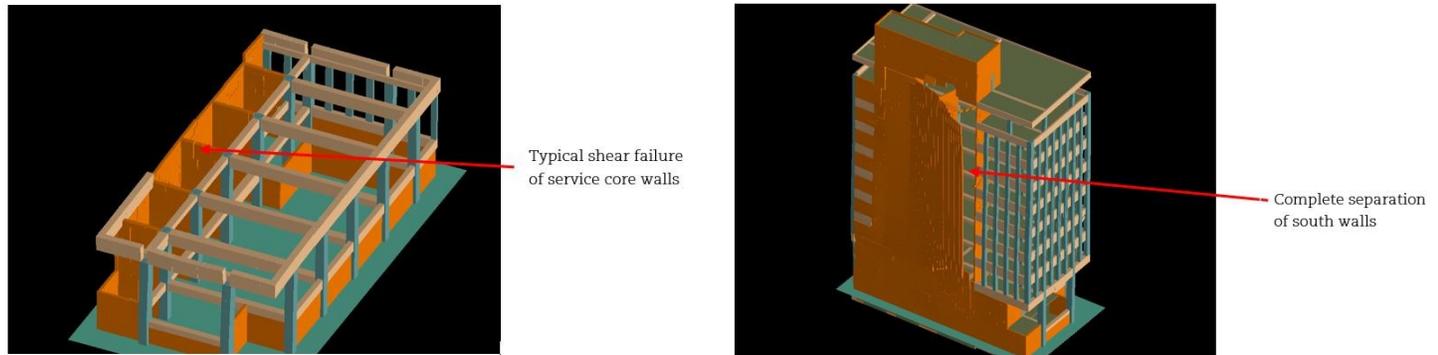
Shear wall failure (left) and complete wall separation (right)
